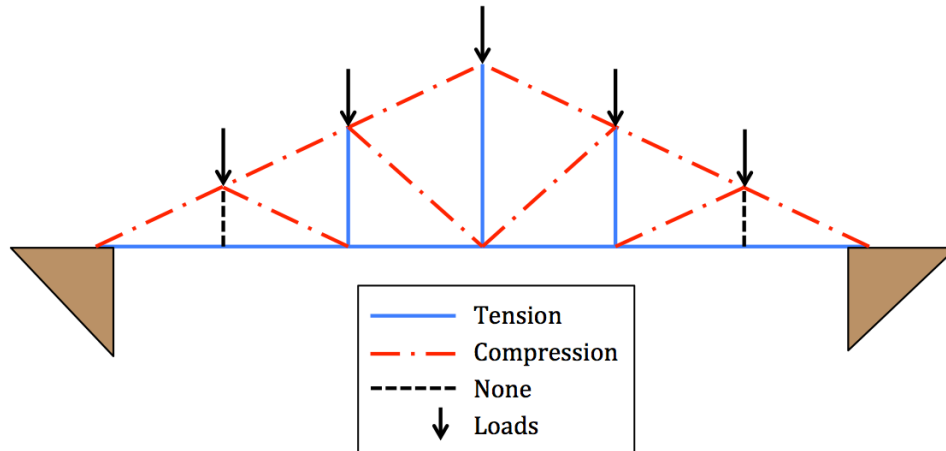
Typical Truss System with Members Labeled for Tension and Compression
